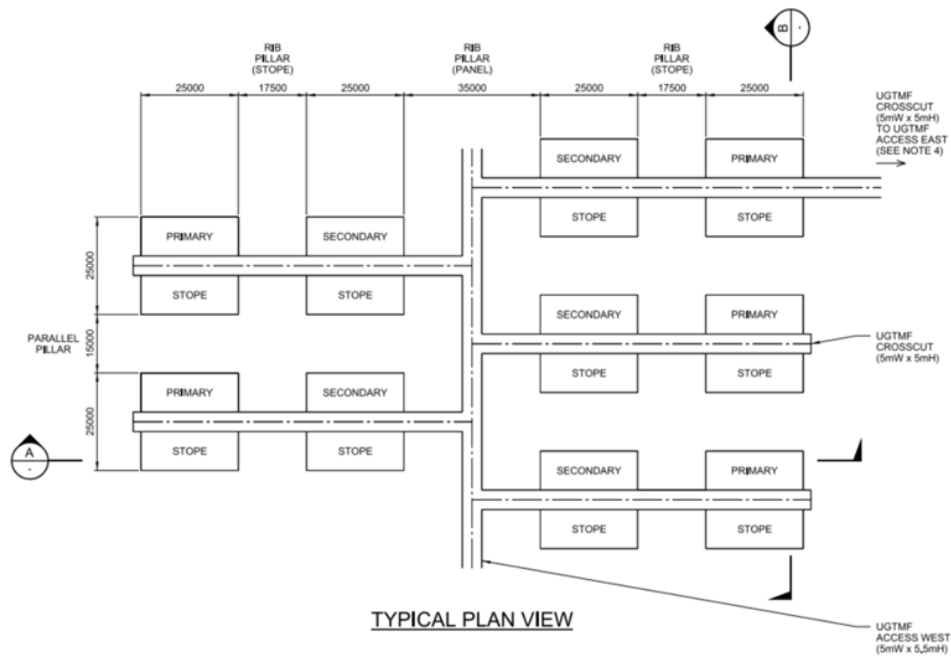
UGTMF chamber/Stope layout (source: NexGen -Rook 1 Project Mining Geotechnical Assessment)
